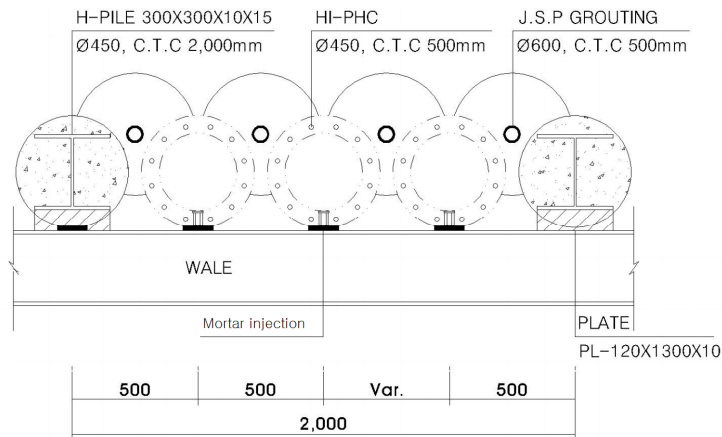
Cross-sectional view of high strength joint buried pile retaining wall method.
